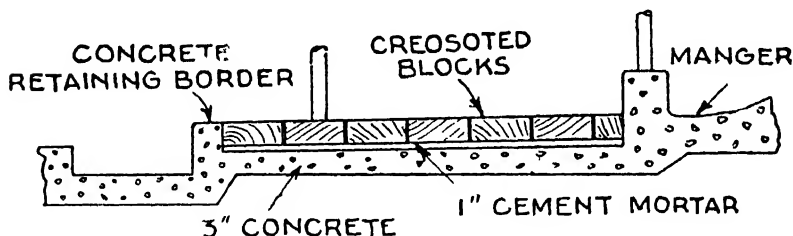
,805.—Dairy barn construction 4. Section through paved stall.
